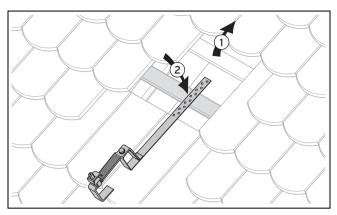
Remove slates and fit type S roof bracket (shown here: on the roof batten)
